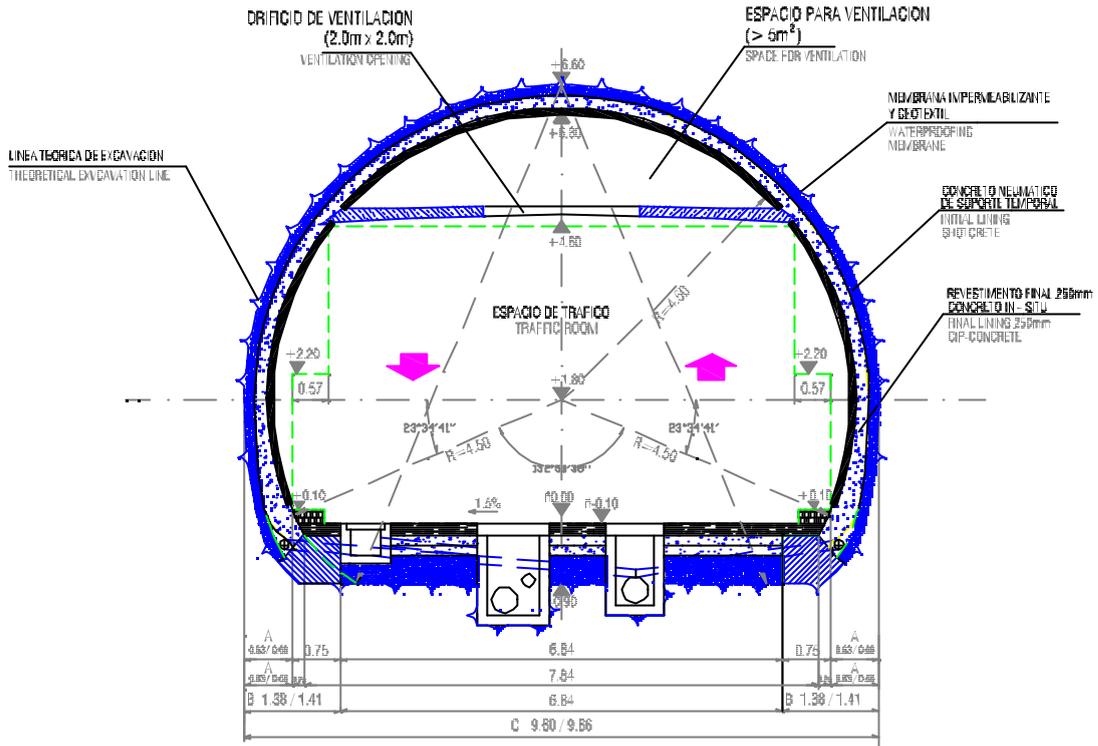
Tunnel cross section with ceiling for semi-transversal ventilation, System UT DIS/EDL - D2 CONSULT
